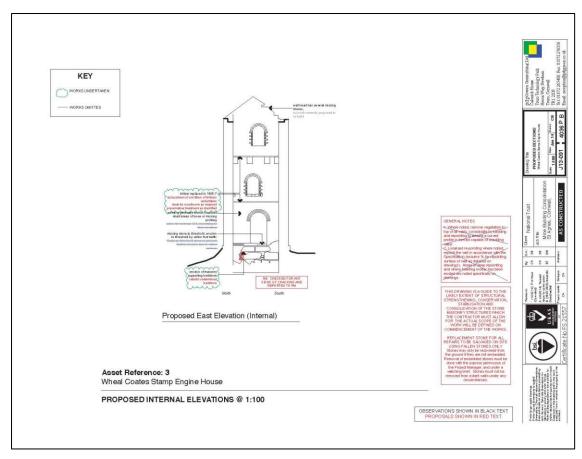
Eastern internal elevation of Wheal Coates stamps engine house.
